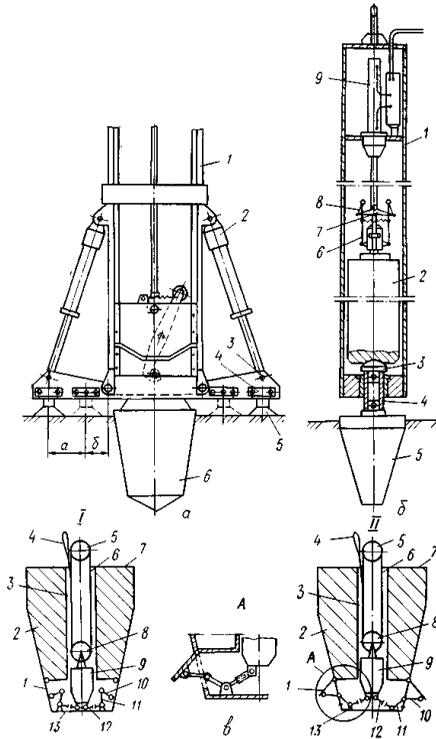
Devices for ramming recesses: *a* - with an extraction mechanism; *б* - shock action; *в* - with a broadened lower part; I - with closed extension flaps; II - with extended flaps
